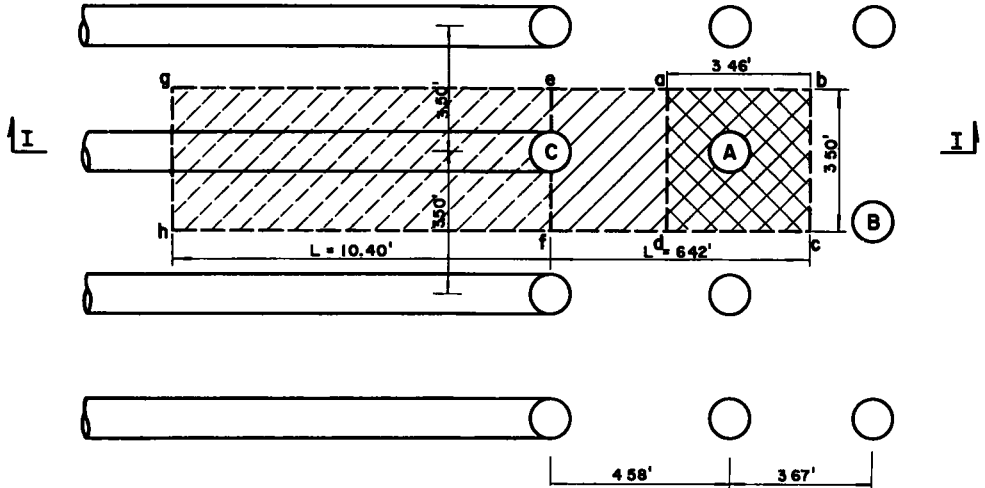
Plan showing column abcd of soil carried by Pile A (see Fig. 19 for Section I-I).
